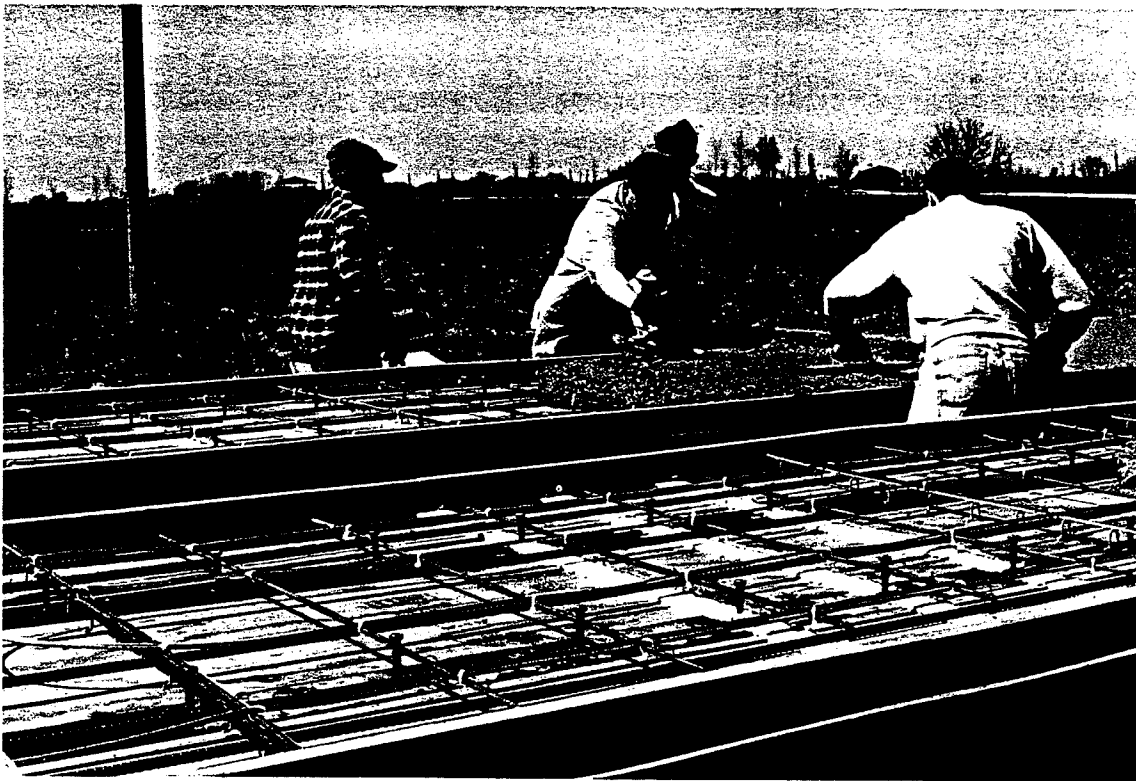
A photo of sealant filled tubes placed in the bottom of the form to be embedded in the bottom surface of decks 3 and 4
